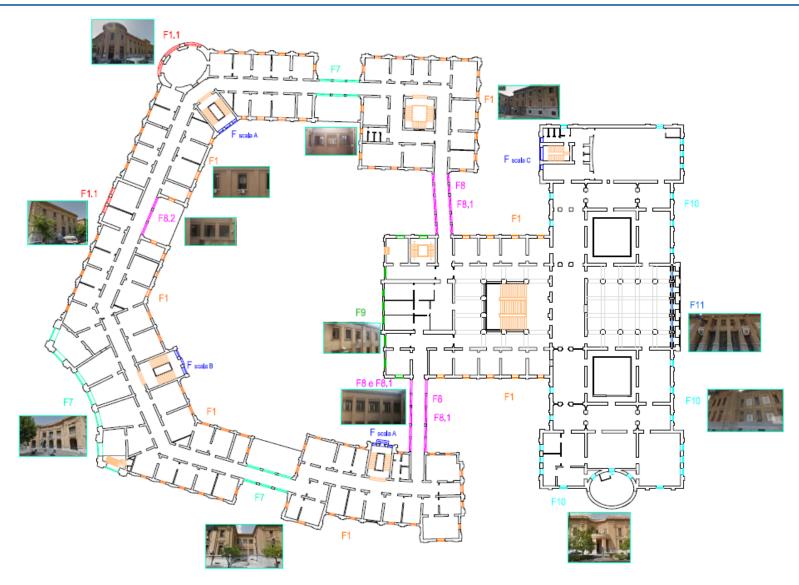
FIRST FLOOR PLANT OF WINDOWS
